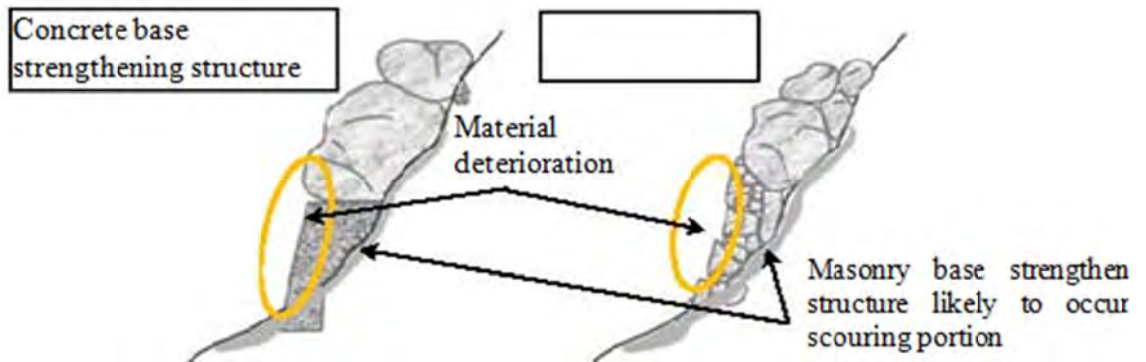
Scouring of rock fall prevention or failure of base strengthening structure
